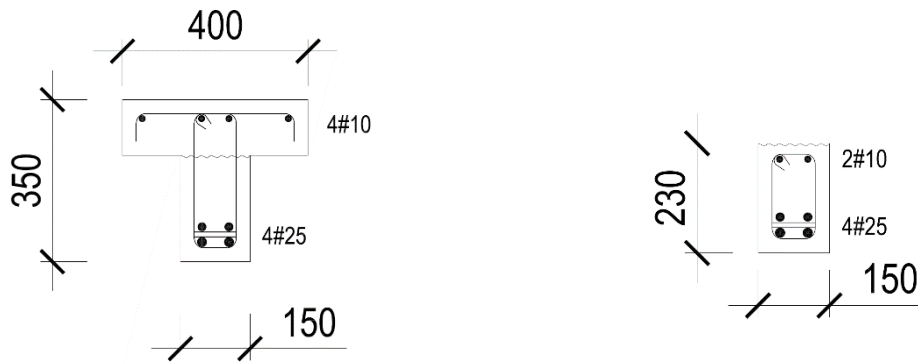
Beam-10 sections with and without a topping flange.
